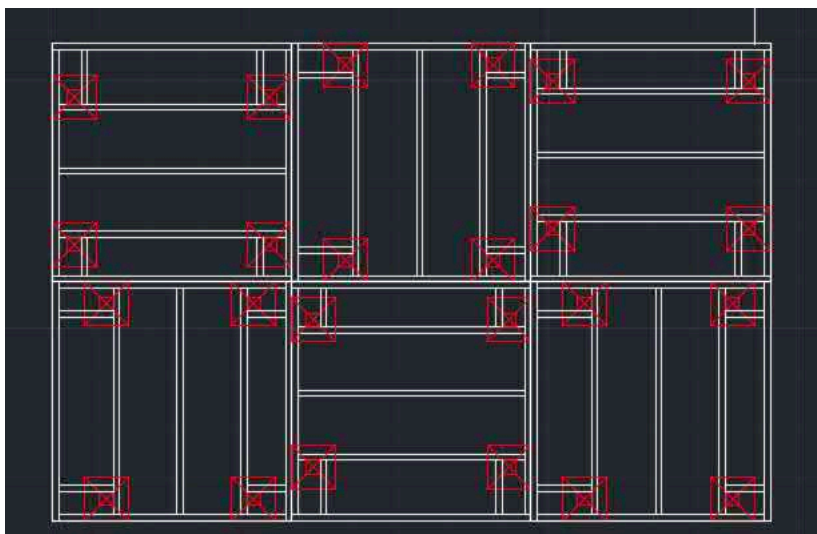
Complete deck size will be 10ft x 15ft built in 5ft x 5ft sections as shown.
